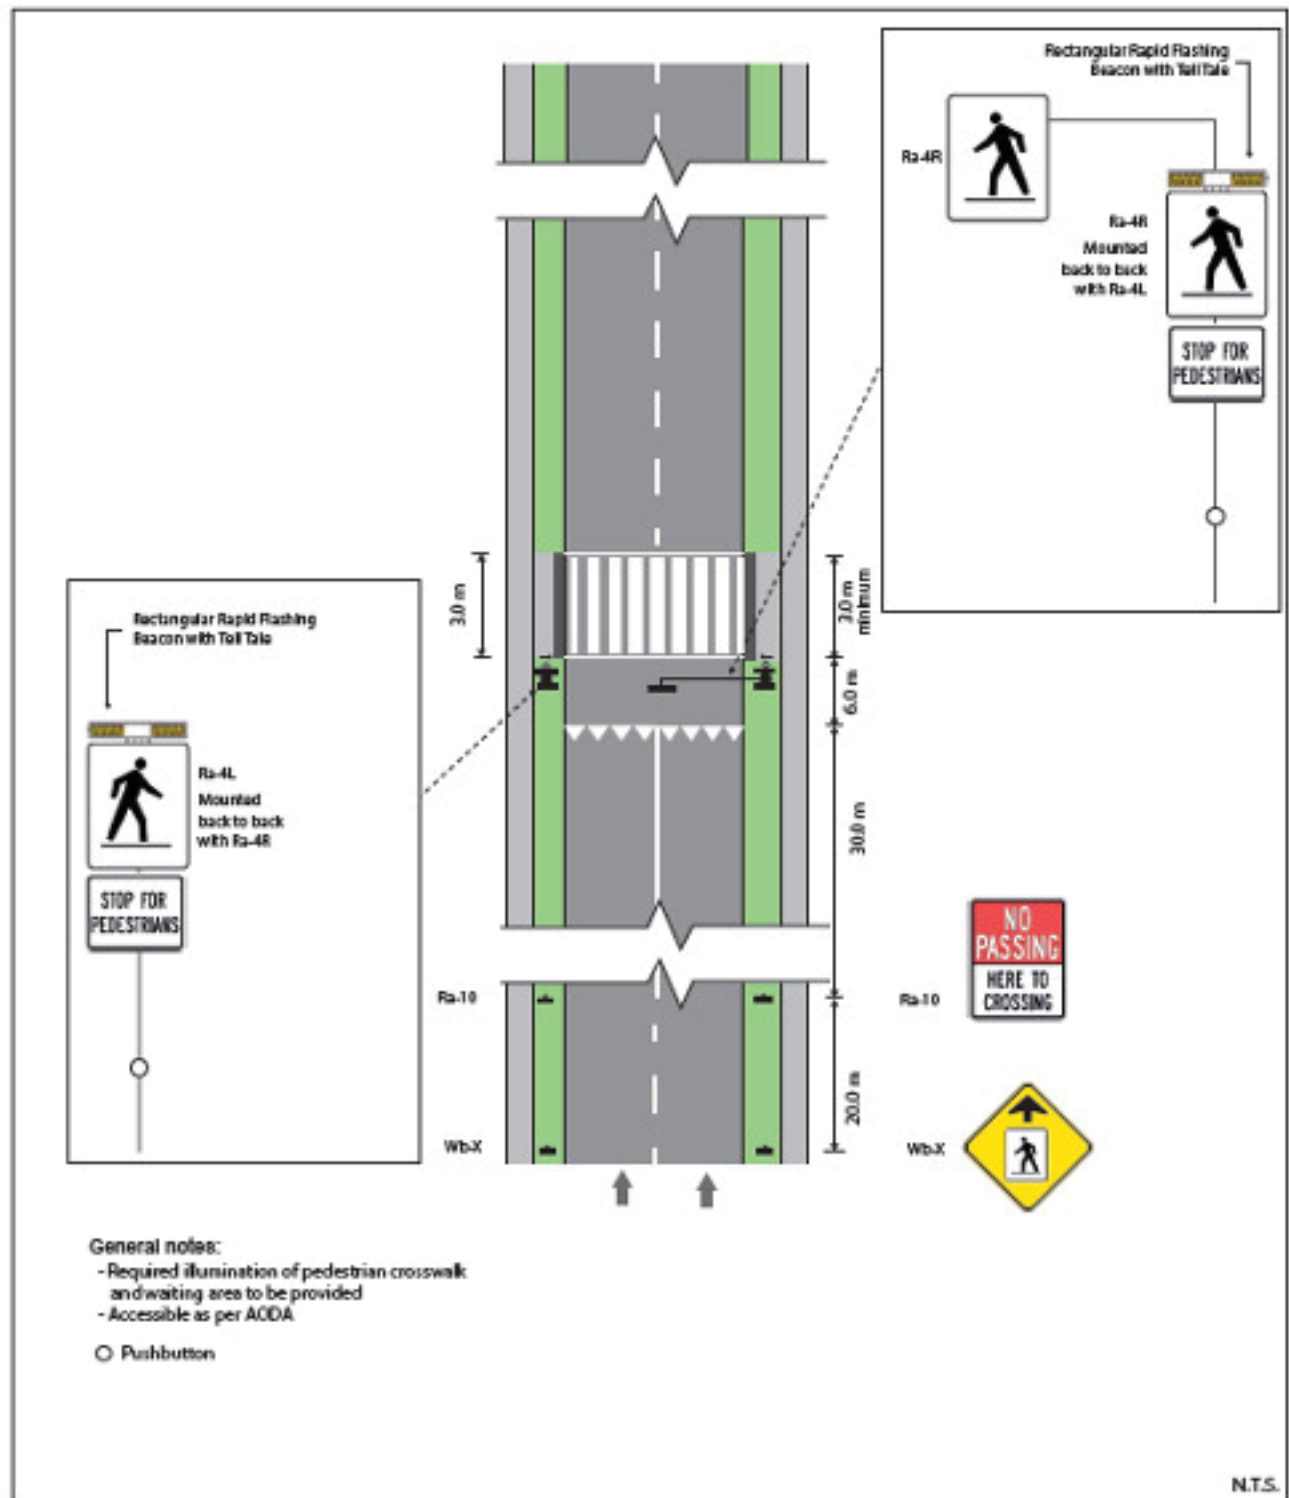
Pedestrian Crossover Type B – Mid-block (2-lane, 1-way)
